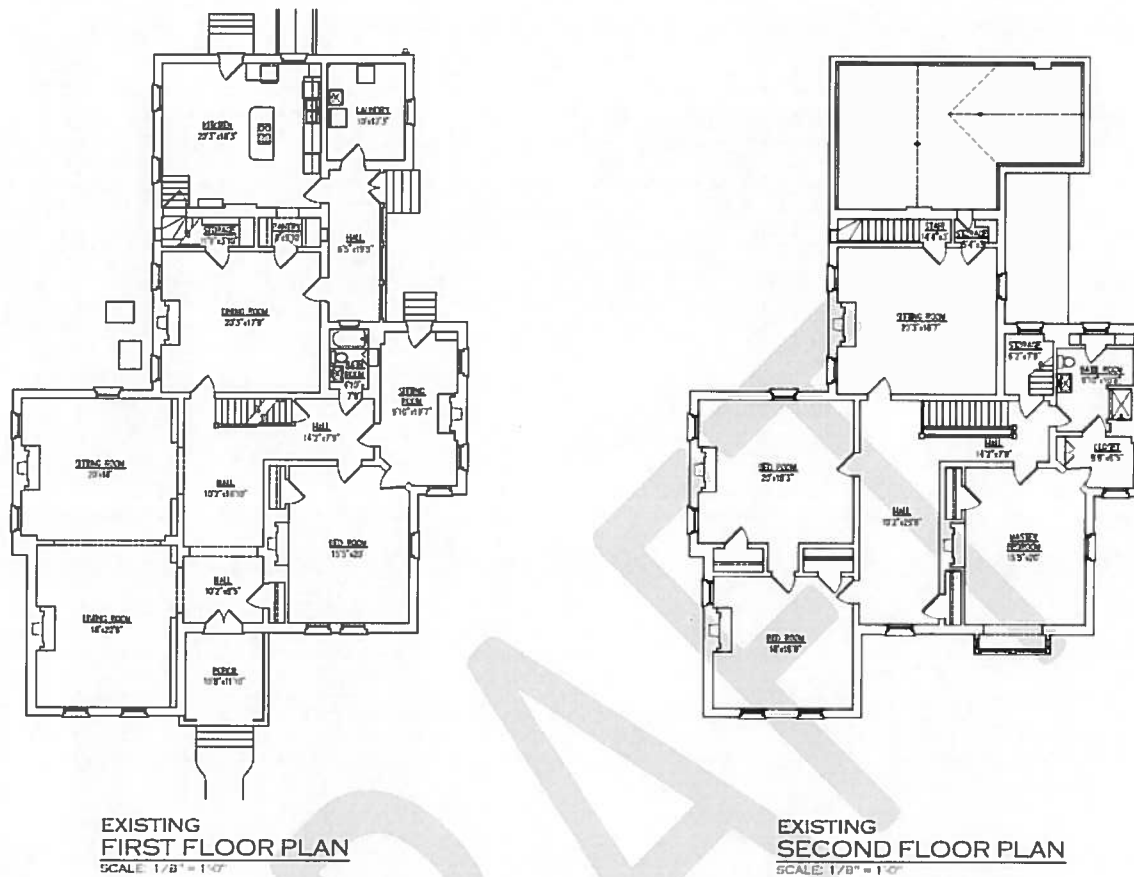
Current First and Second Floor Plans, drawn by Stewart Architects, PLLC- 2018.
